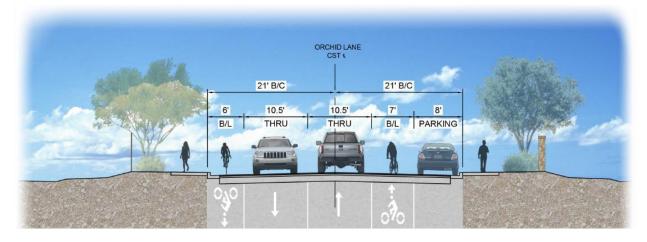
Orchid Lane Typical Section - Segment H3 Standard Bike Lanes/South Side Parking B
